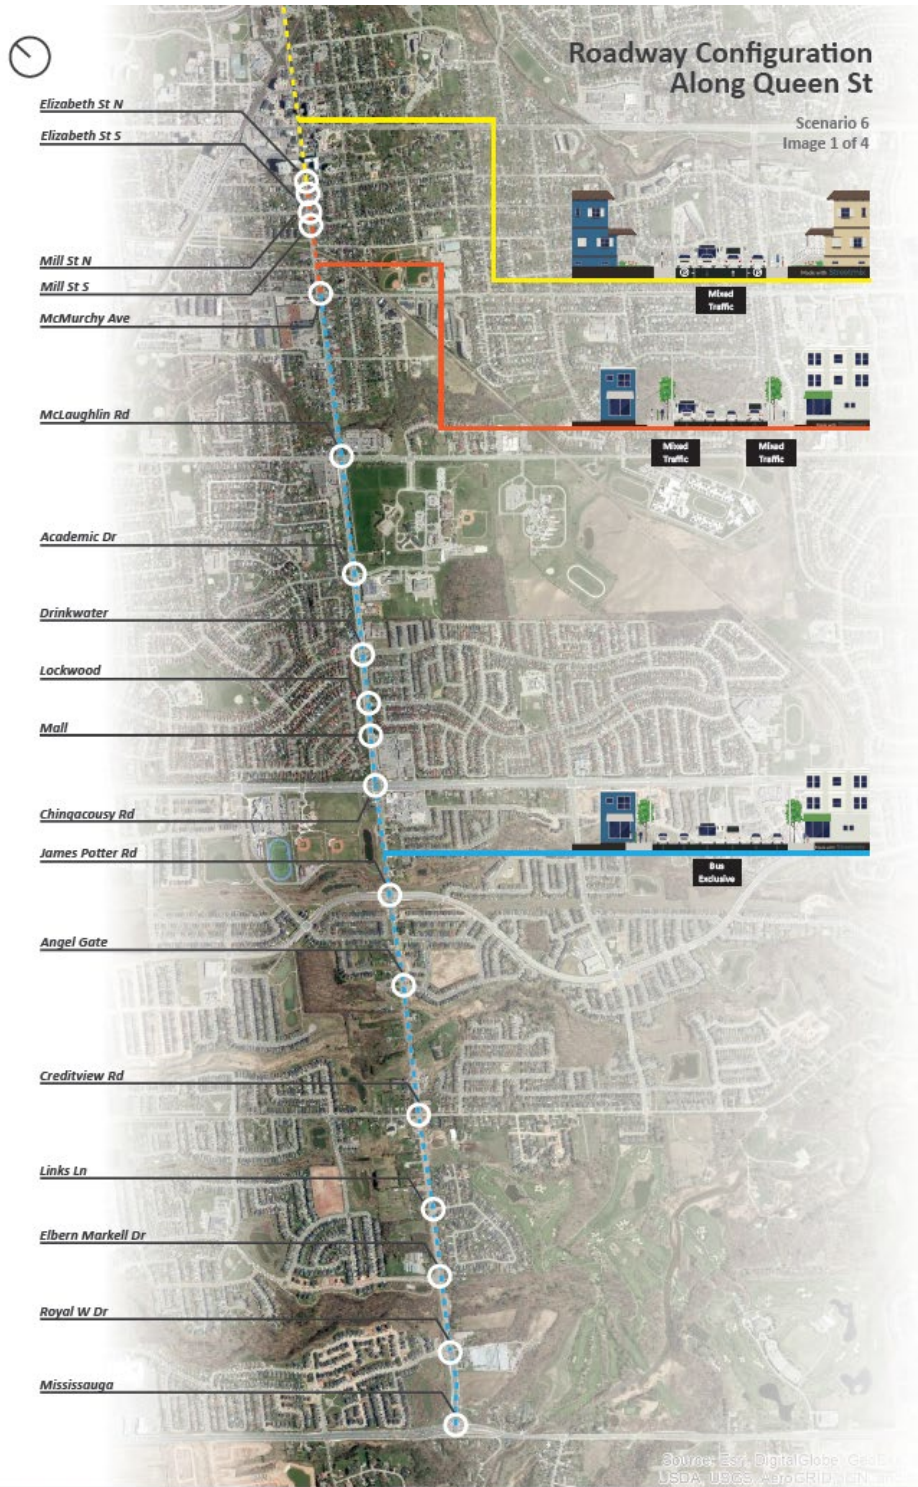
Scenario 6 road configuration, Mississauga Road to Mill Street North
